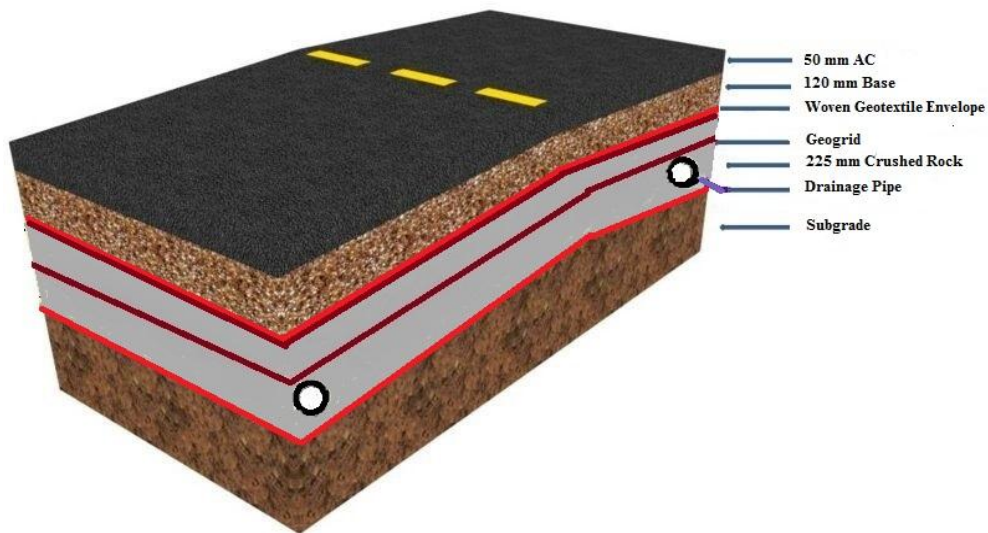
Design Cross Section of Crushed Rock Control Section
